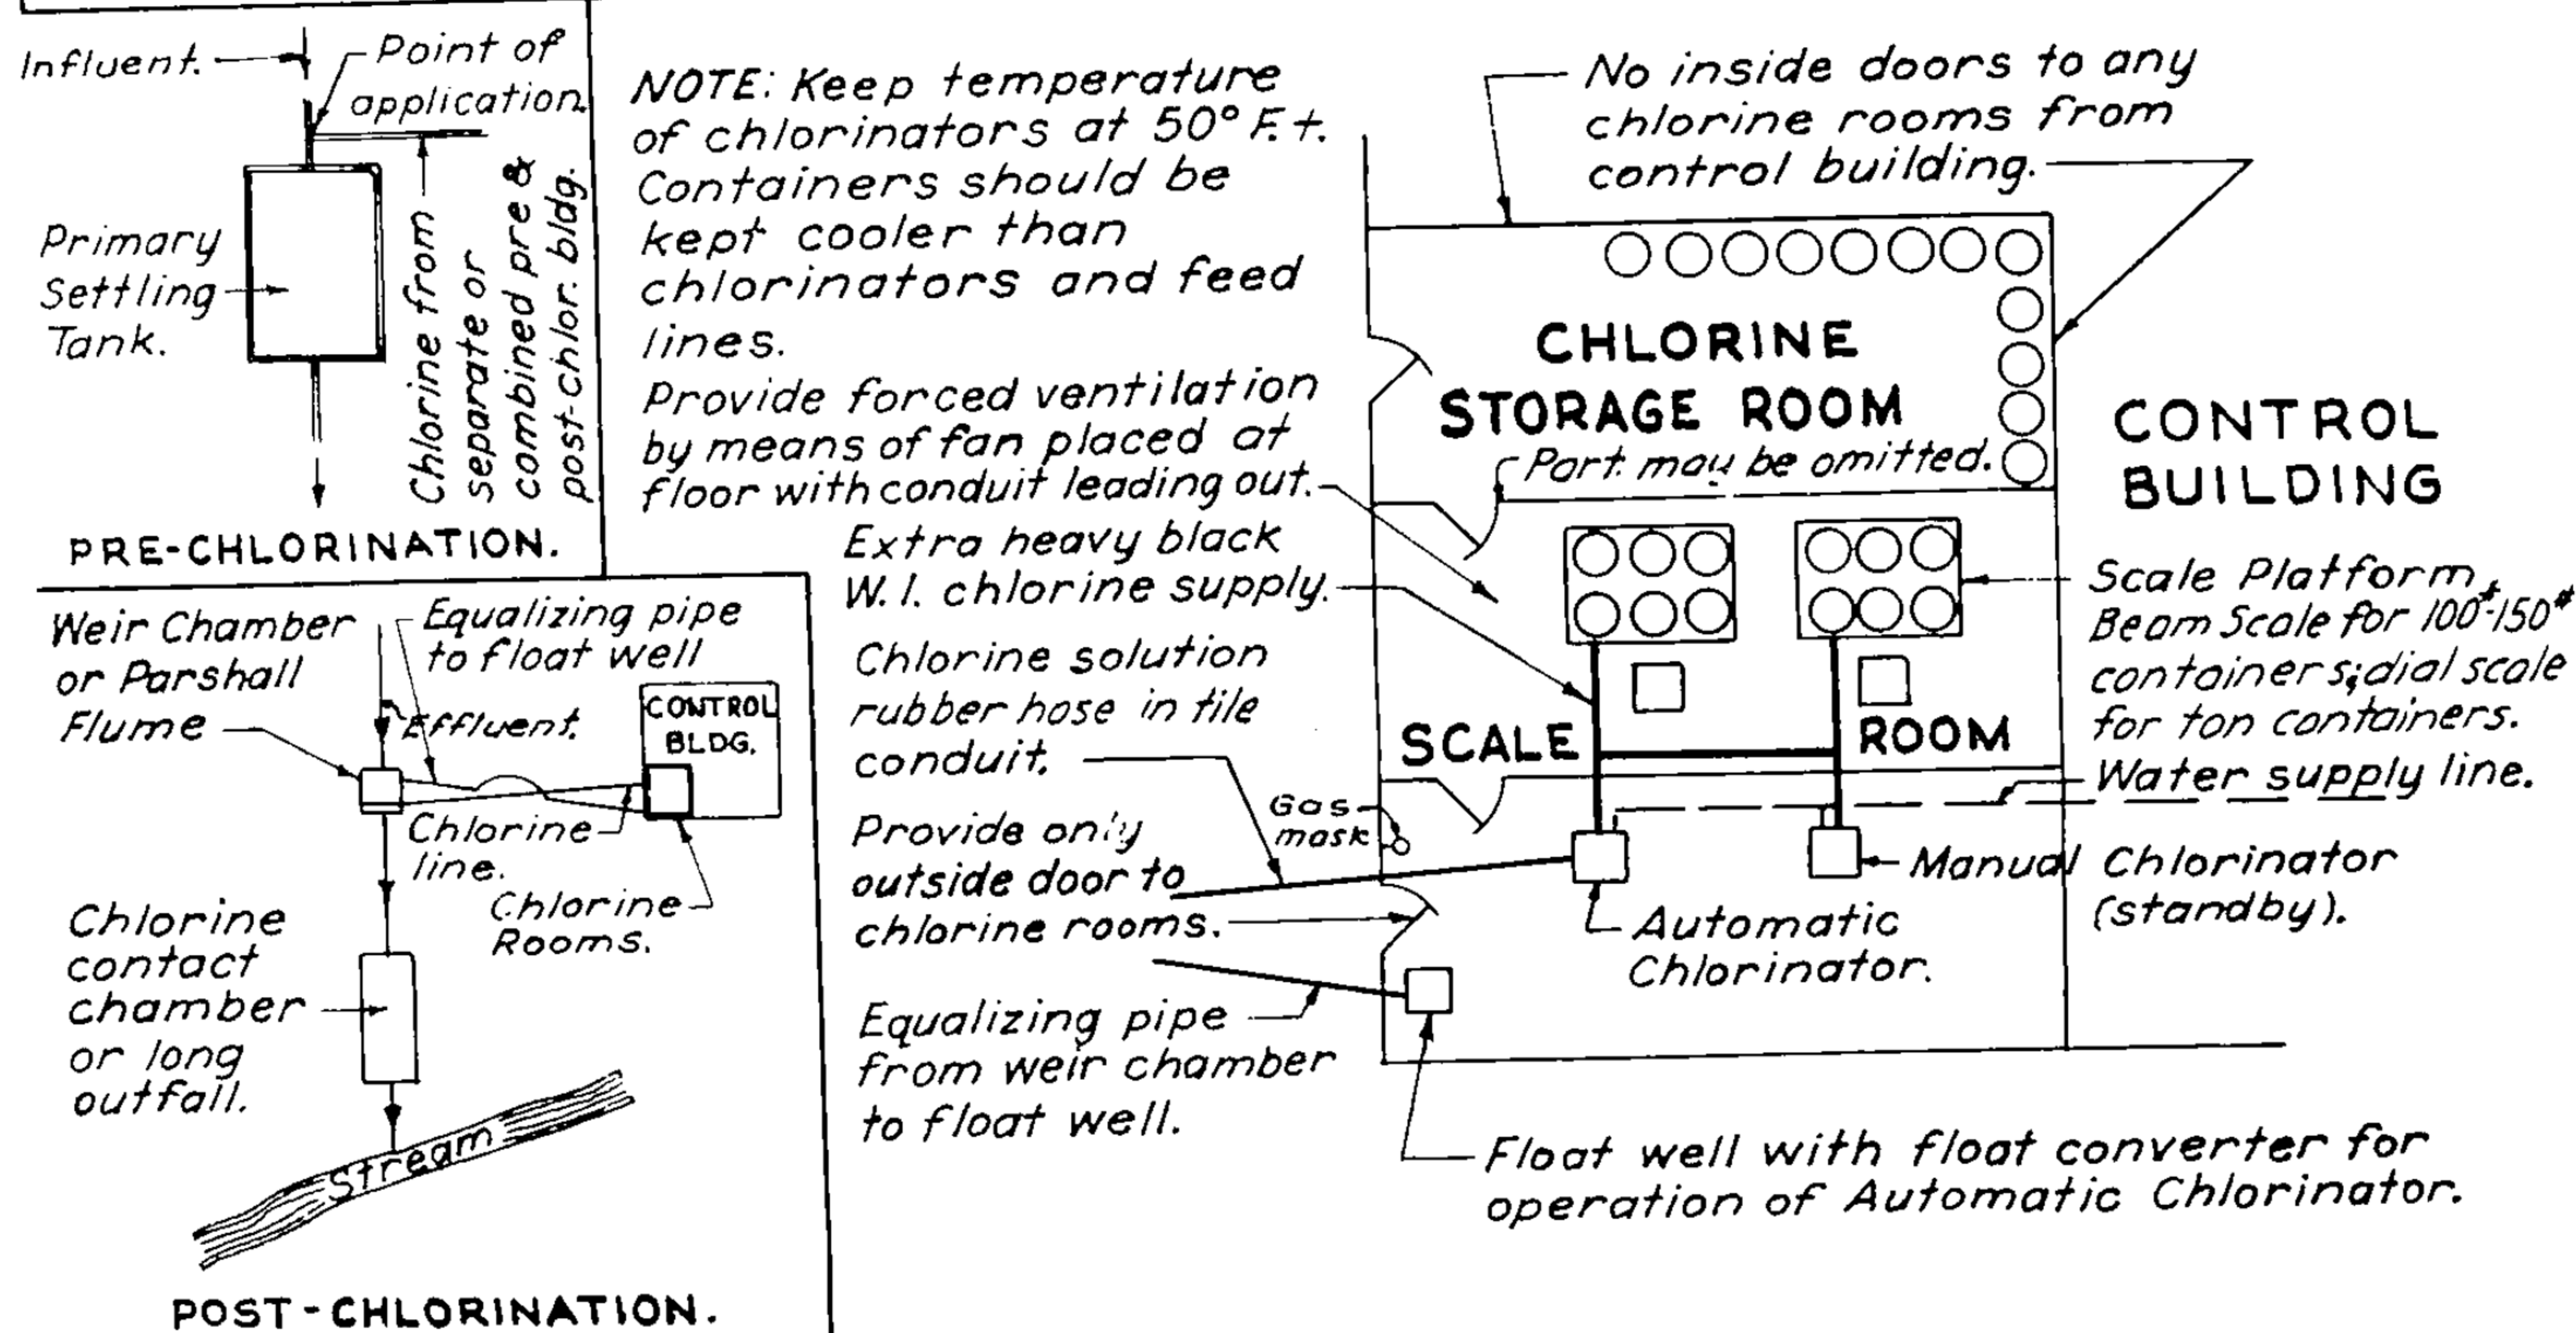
FIG. B— TYPICAL LAYOUT FOR CHLORINATOR INSTALLATION.
